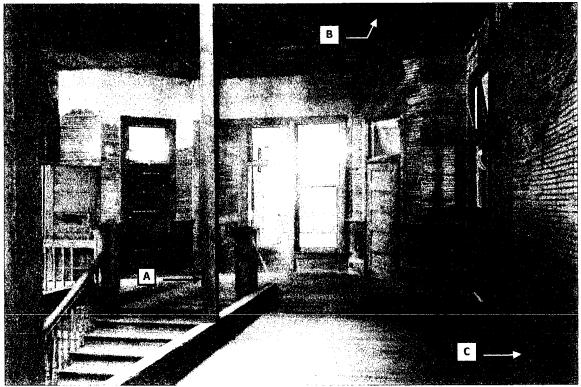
Level 3 Stair Hall view east. (A) Shoring pier and beam per 2010 structural retrofit, (B) Lath and plaster are missing from ceiling, (C) Wainscot paneling separating from wall.
